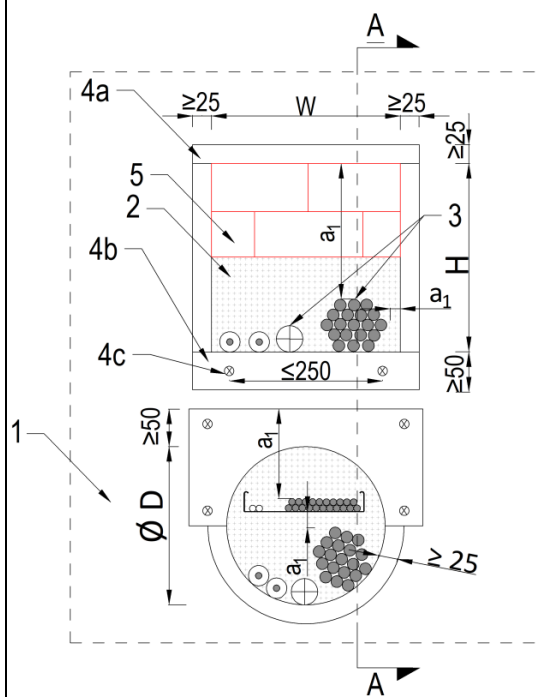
Cable passage in a flexible wall – detail with increased wall thickness
